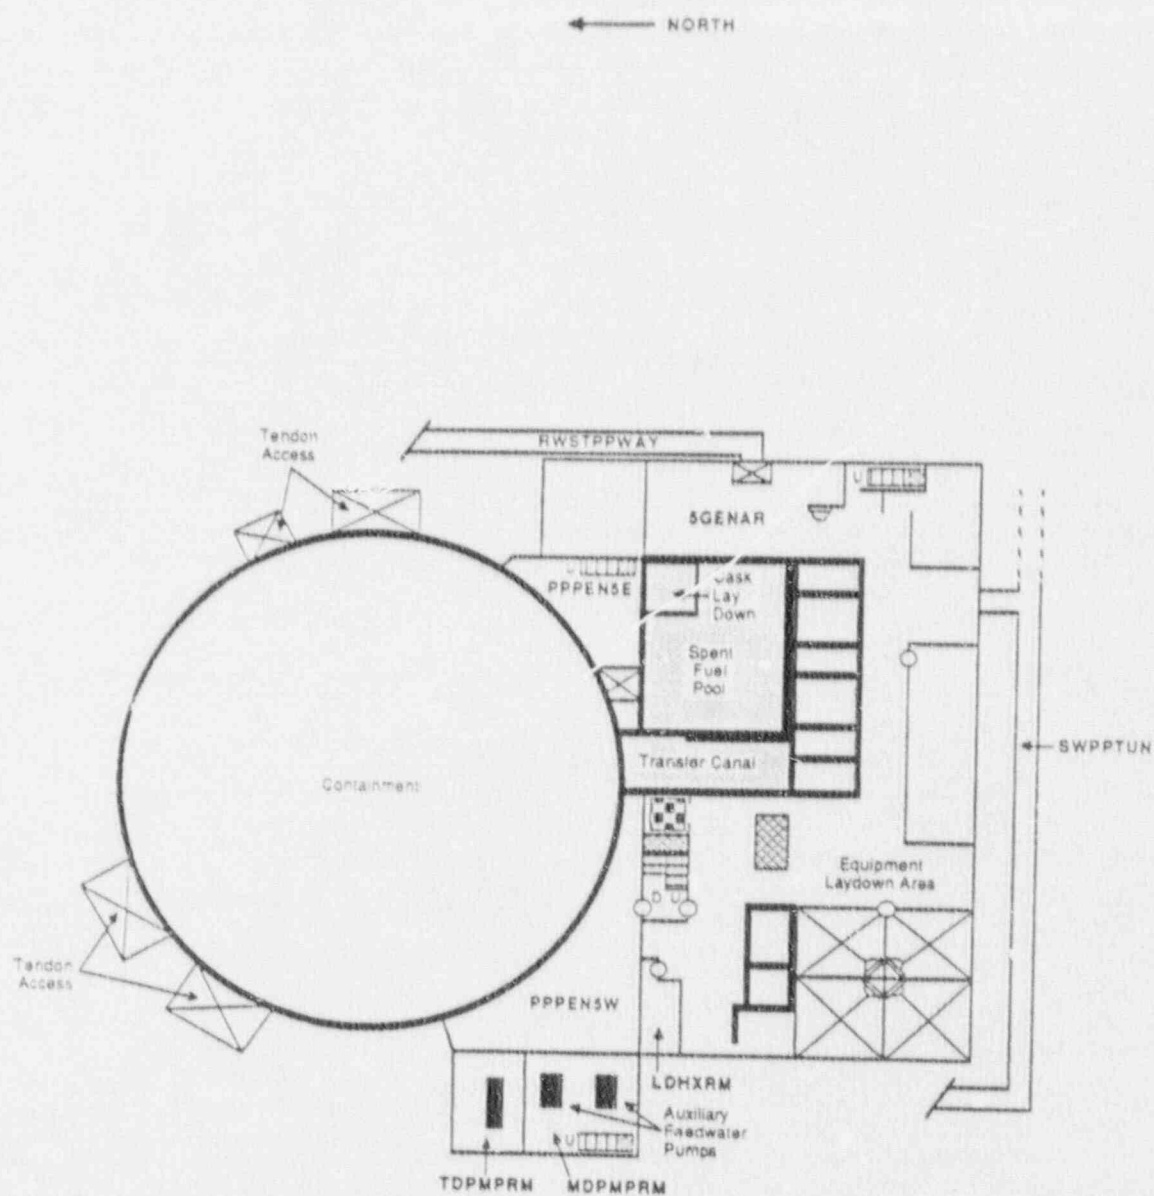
Millstone 2 Containment and Auxiliary Buildings, Elevation -5' 0", and Turbine Building, Elevation 1' 6"
